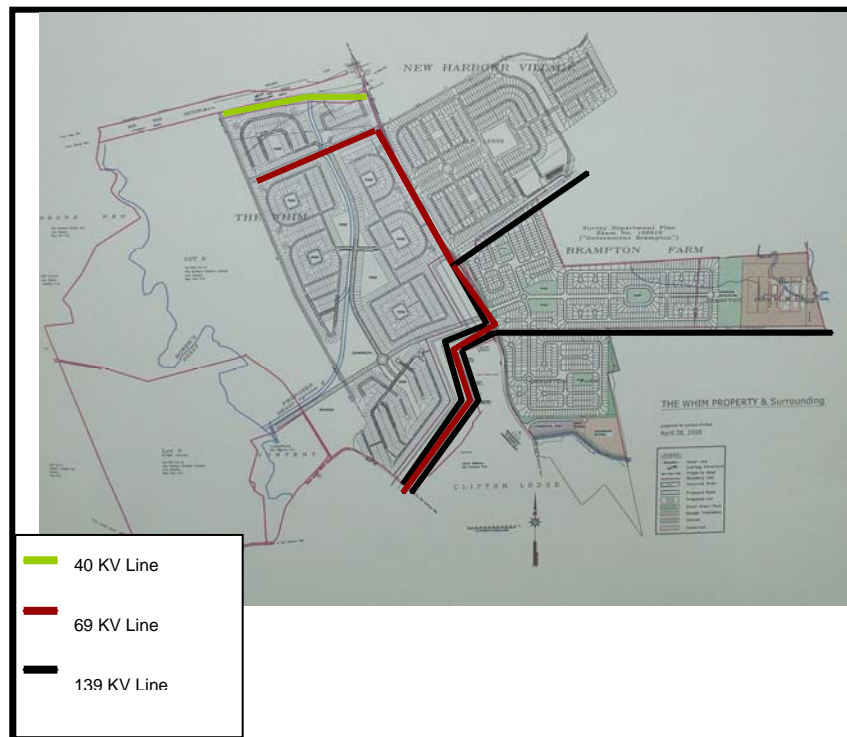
Proposed layout of Power lines Transiting the Development Site
